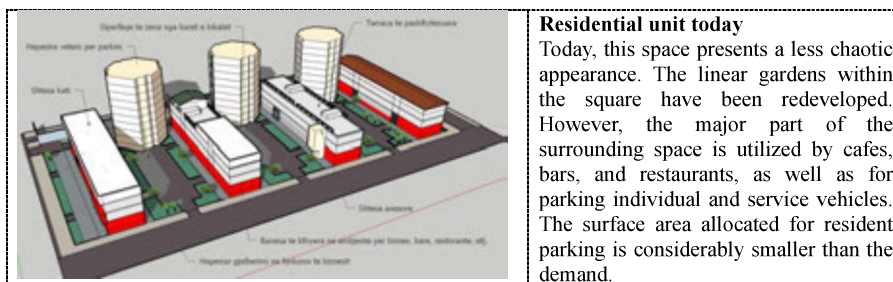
3D image of the residential unit in the existing situation. Source: author drawings based on plans from AQTN, Tirana.
